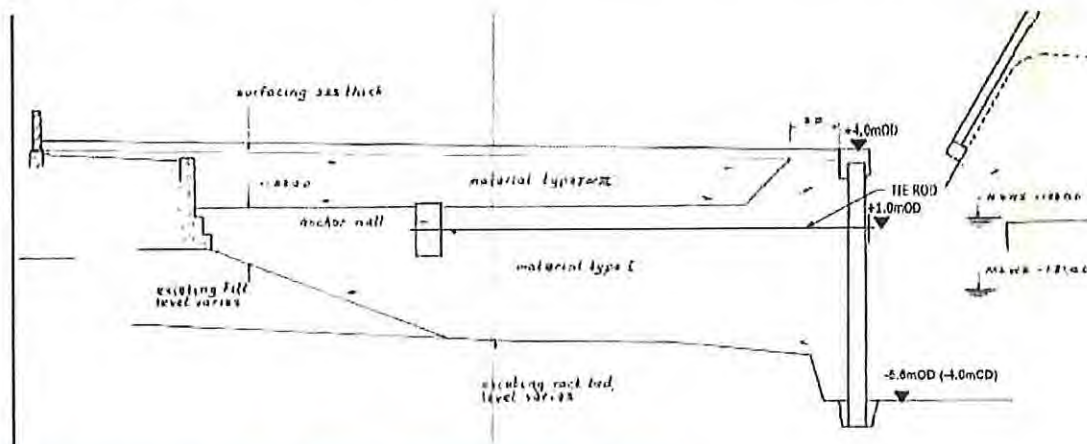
Typical cross section perimeter wall (constructed circa 1975)
